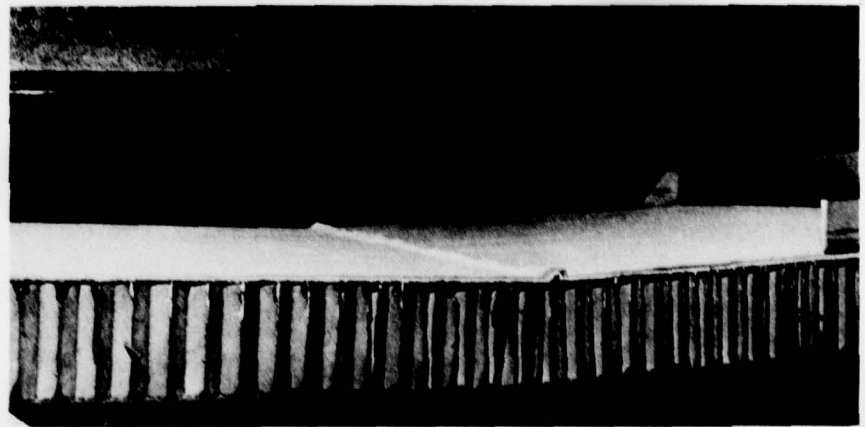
View of failure in paperboard facing due to local buckling on compression side (Panel No. 1N2). (M 147 103-1)
